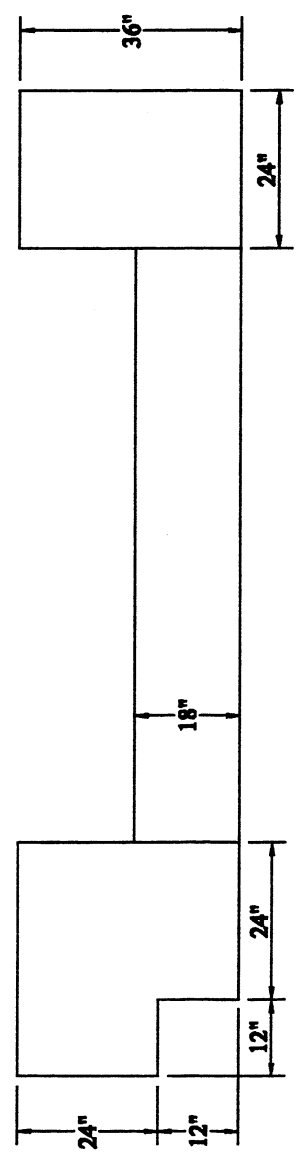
Reinforcement details for the 12<sup>th</sup> to 14<sup>th</sup> floor beams of exterior transverse frames.
